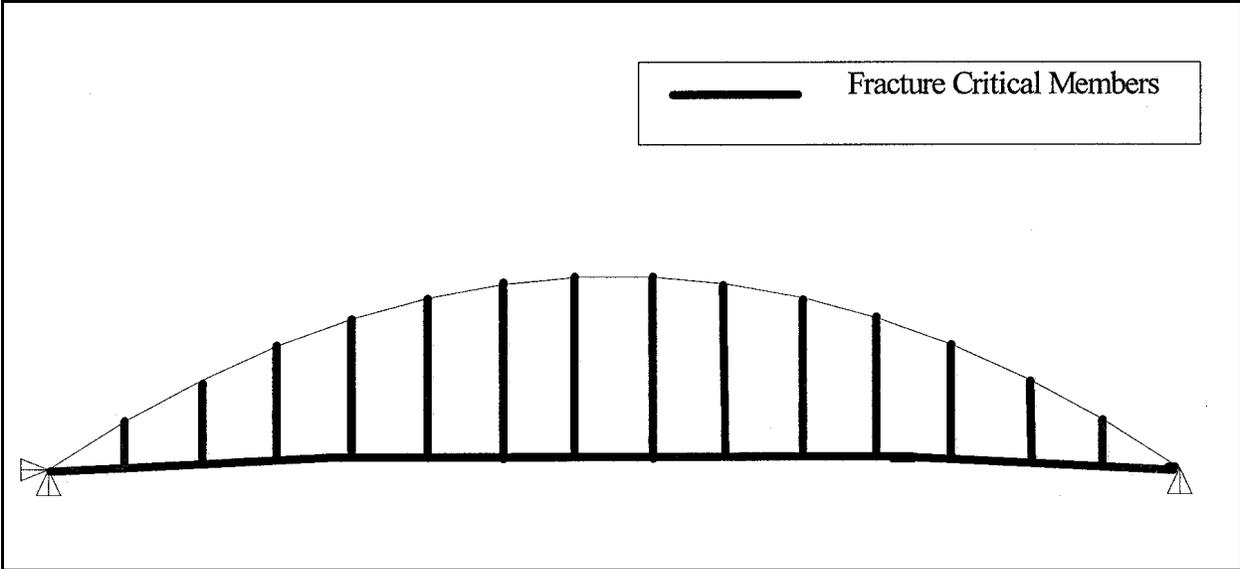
St. George's Highway Bridge (FCM in the tied arch span)
